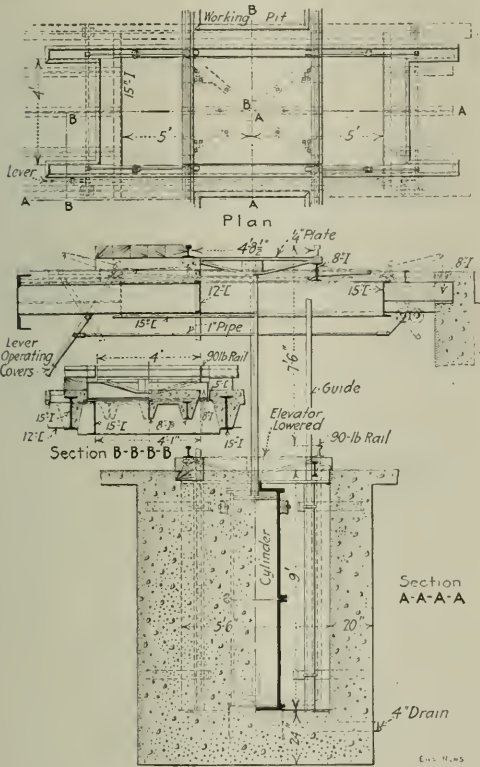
SECTION OF WHEEL PIT AND ELEVATOR
